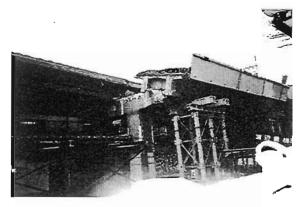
Train Line in Kobe: Narrow twin I-girder carrying one track almost fell off portal pier transversely - the missing one probably did fall off sideways.
